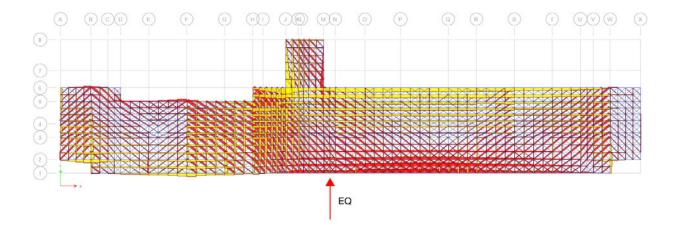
Grillage model of a typical floor plate in the transverse direction
